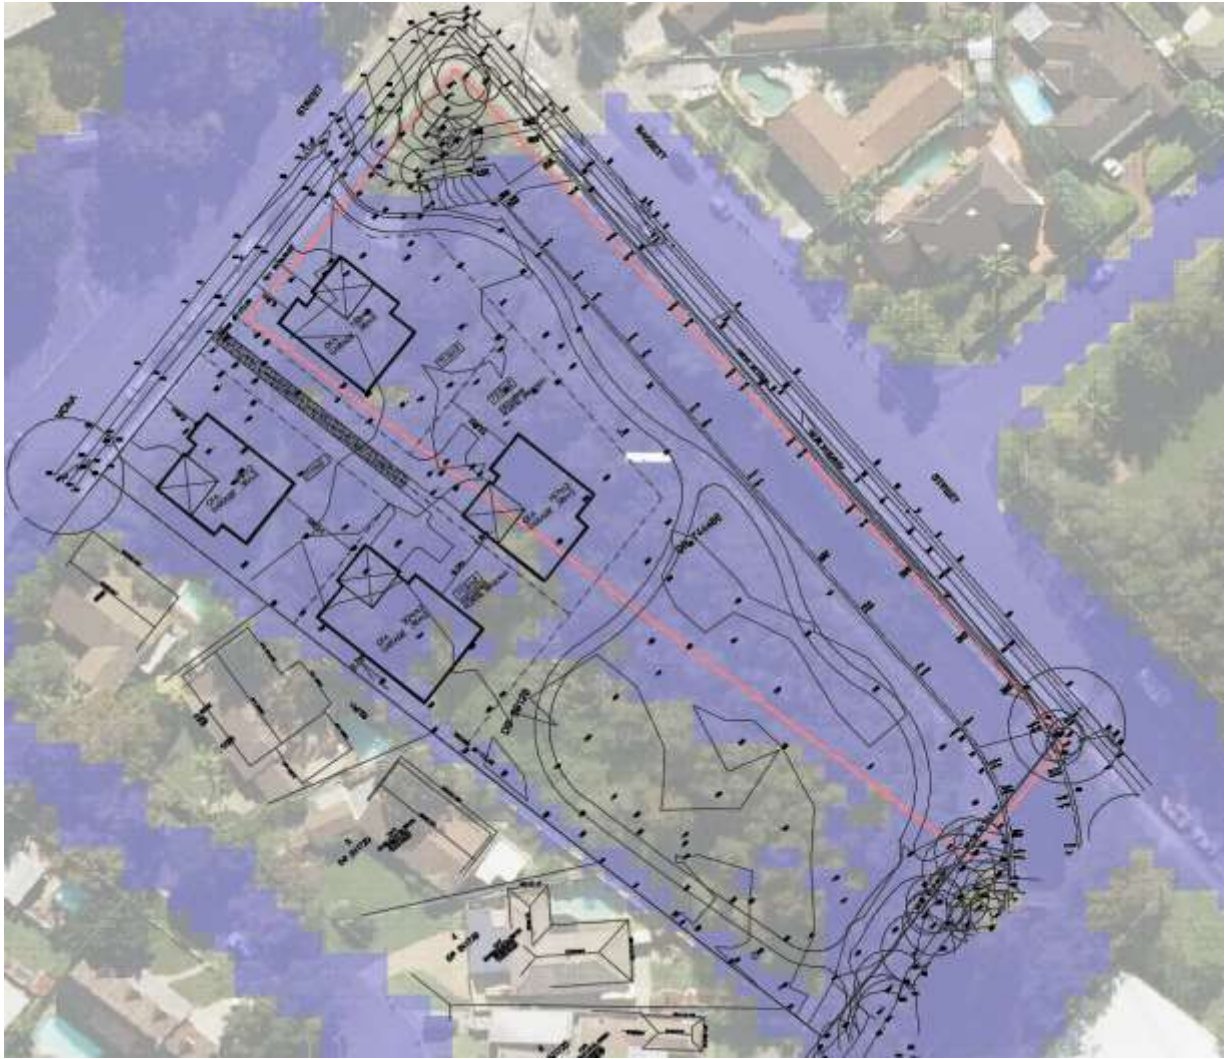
100YR Flood Extent Plan (Source: Zait Engineering dated 15/10/20)
